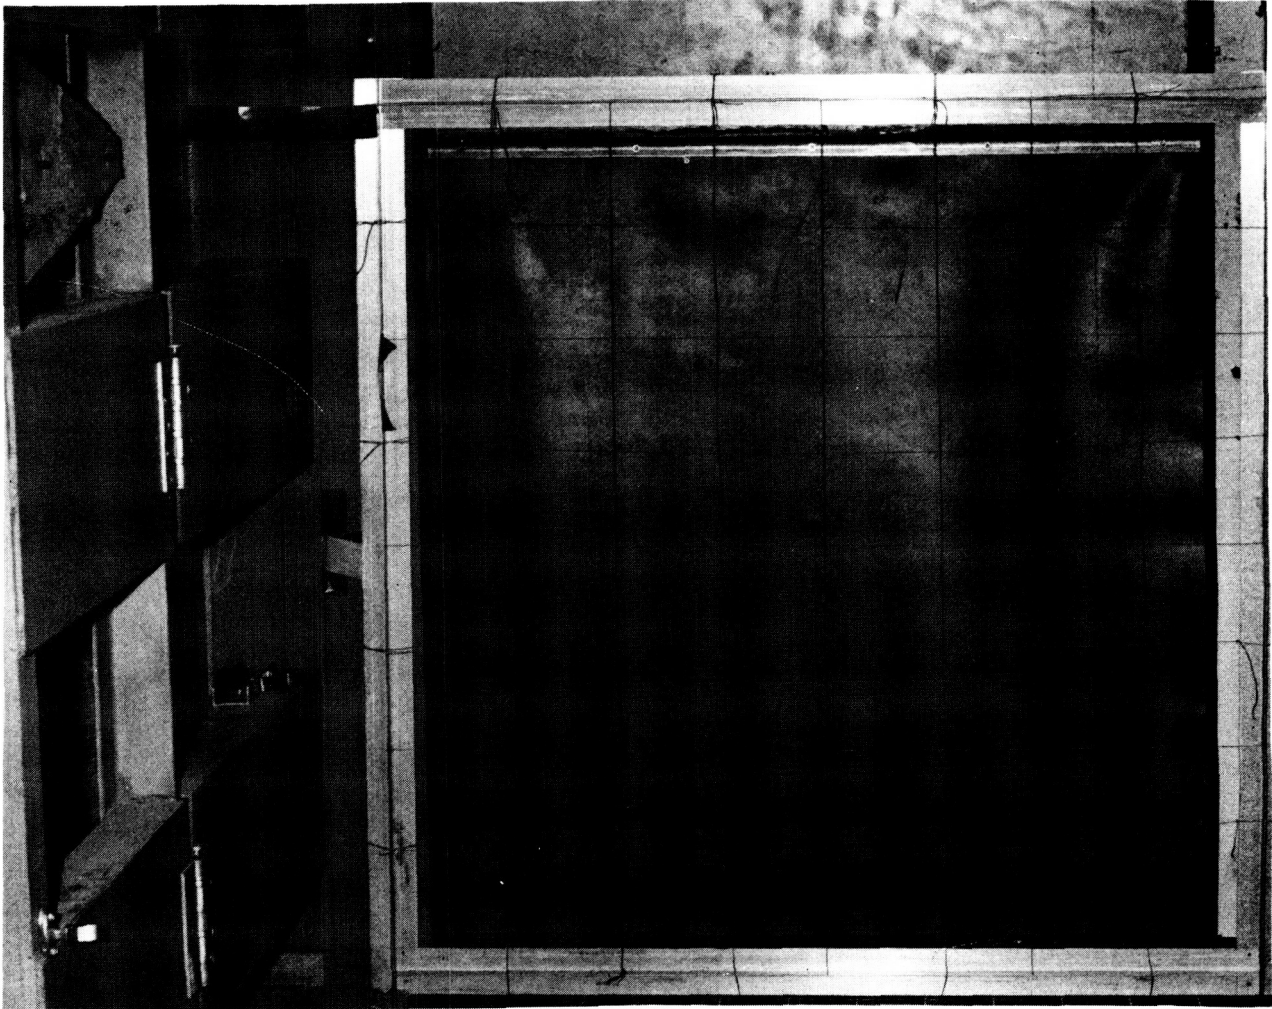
Panel Testing - Reference Specimen, Anechoic Room Side.
